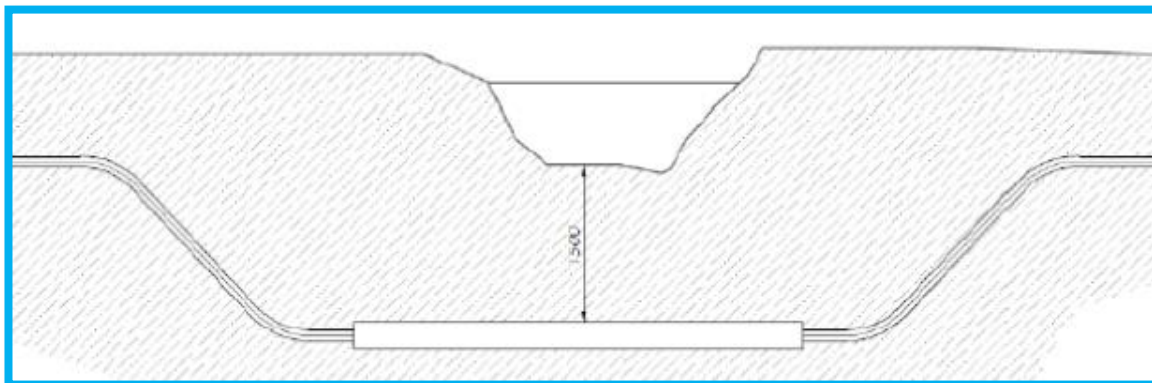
Typical section of a ditch crossing by a cable using no-dig techniques.
